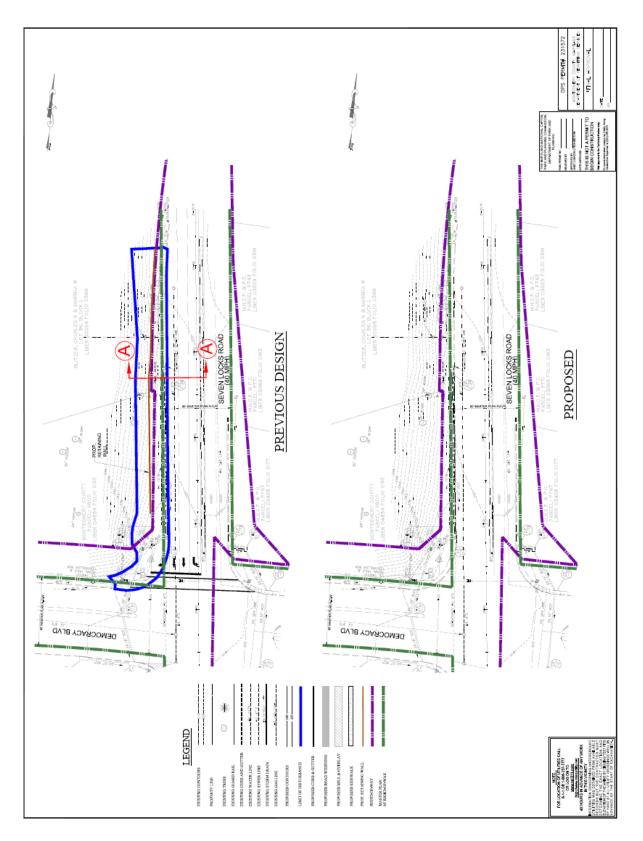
Existing and Proposed Design North side of Intersection (Southbound Lanes)
